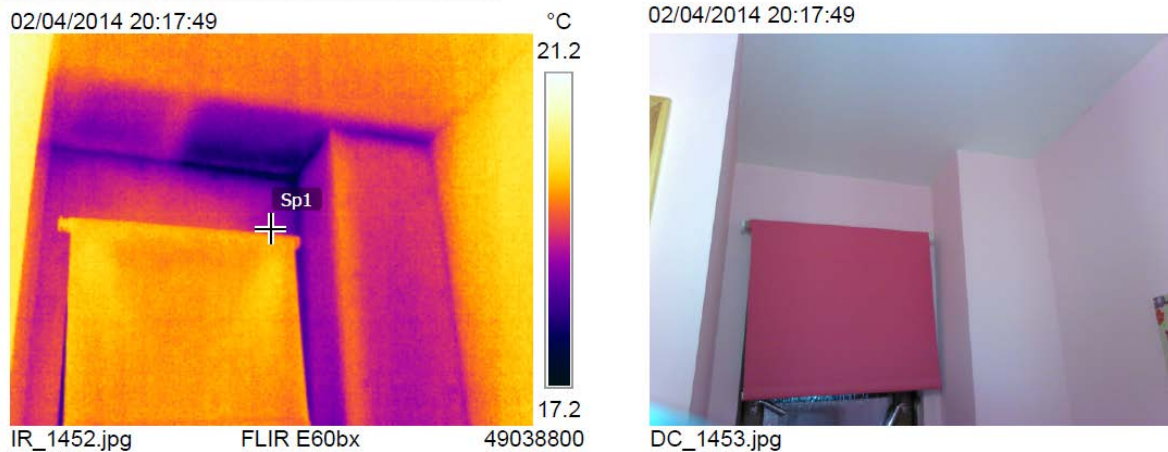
9: Thermal image of wall under test, highlighting location of non-repeating thermal bridge in ground floor WC ceiling, missing insulation is suspected.
